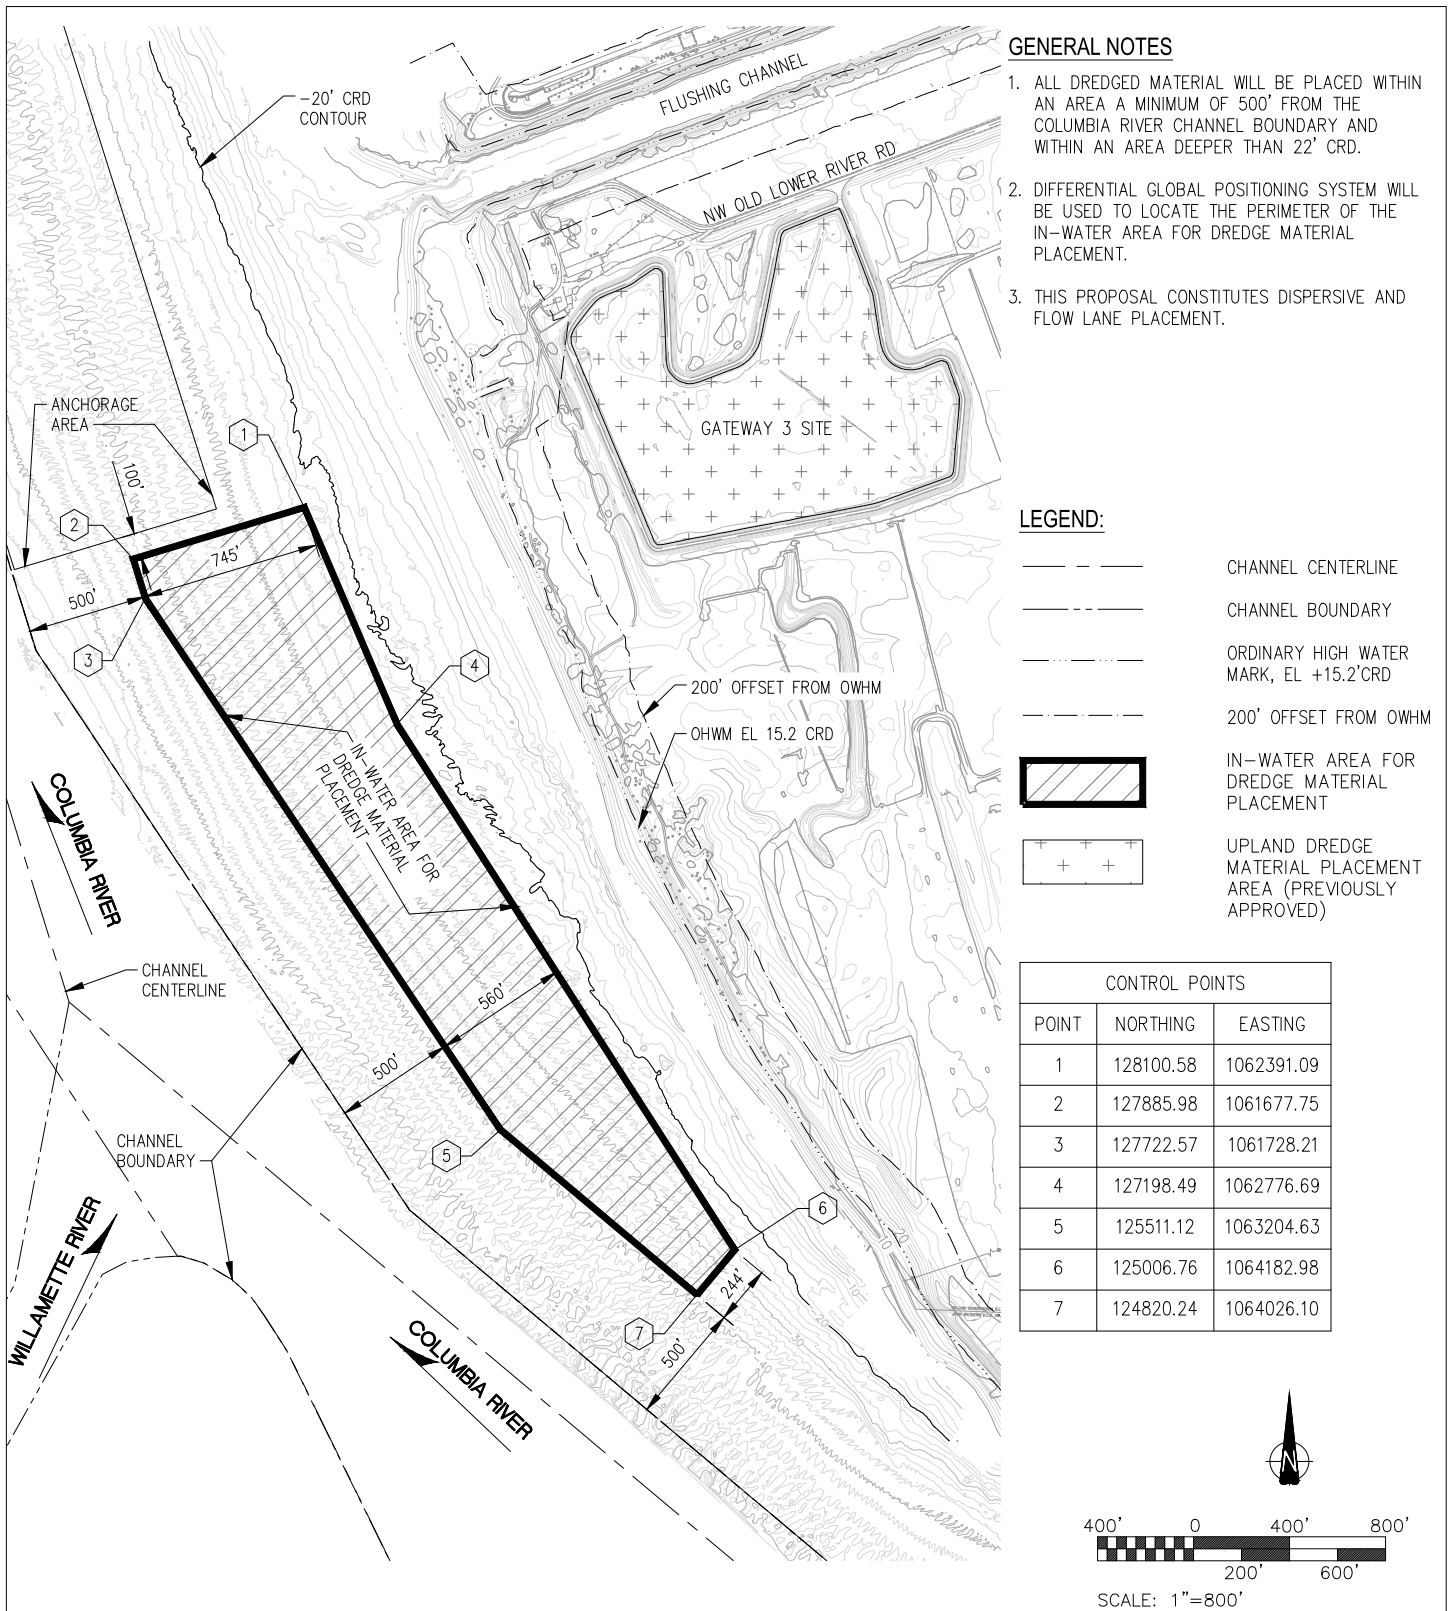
FLUSHING CHANNEL SITE PLAN
